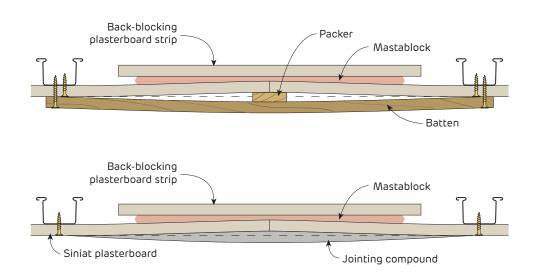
Creating a Recess on a Ceiling Butt Joint using a Temporary Packer Section
